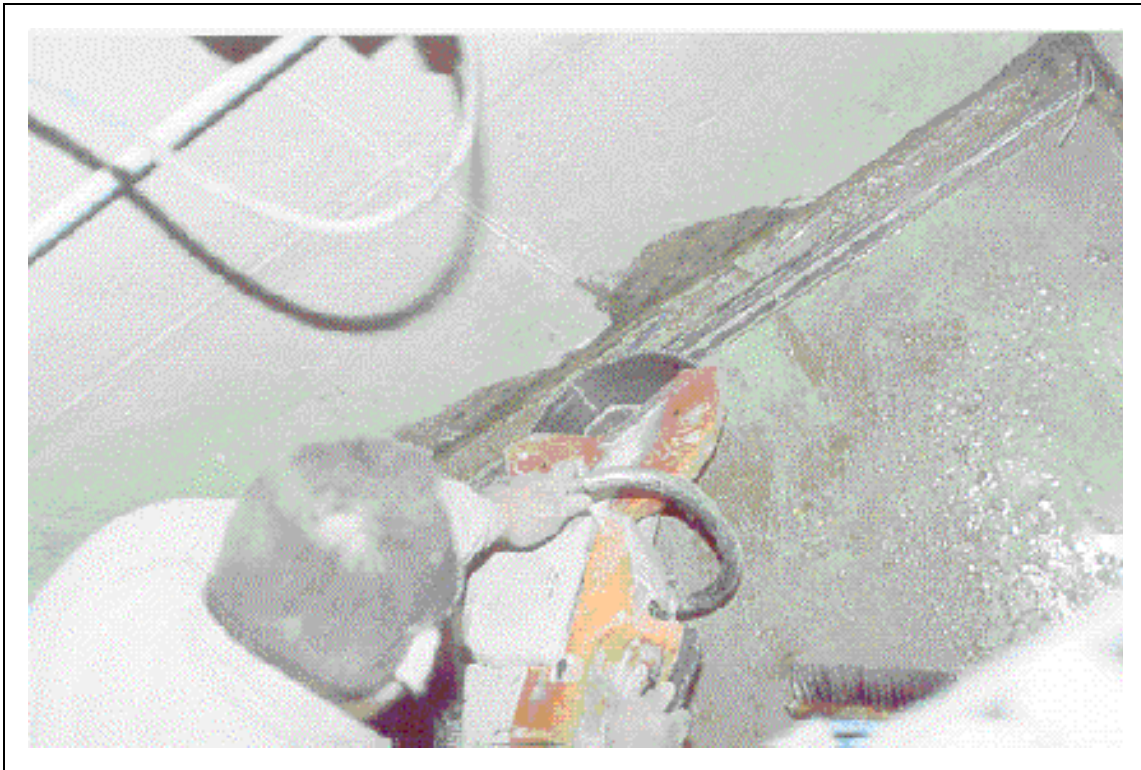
Concrete saw in use to make 45° cut into wall-to-floor joint, concrete basement.
